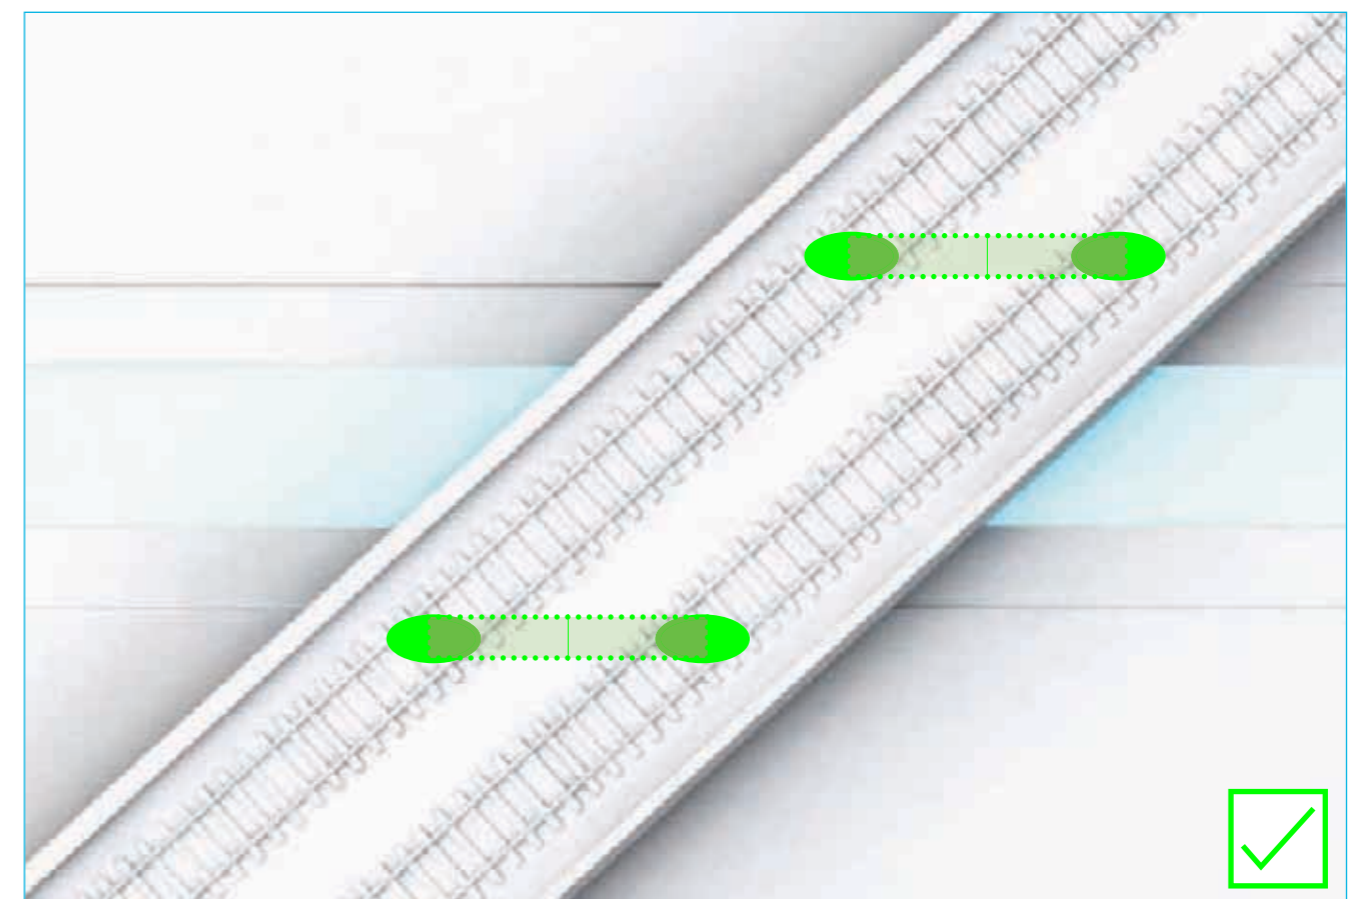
Piers aligned to the canal do not create 'dead' spaces for skewed crossings
